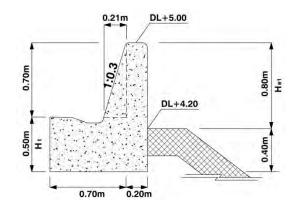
Parapet Shape of Ocean Side (Bairiki Side)
